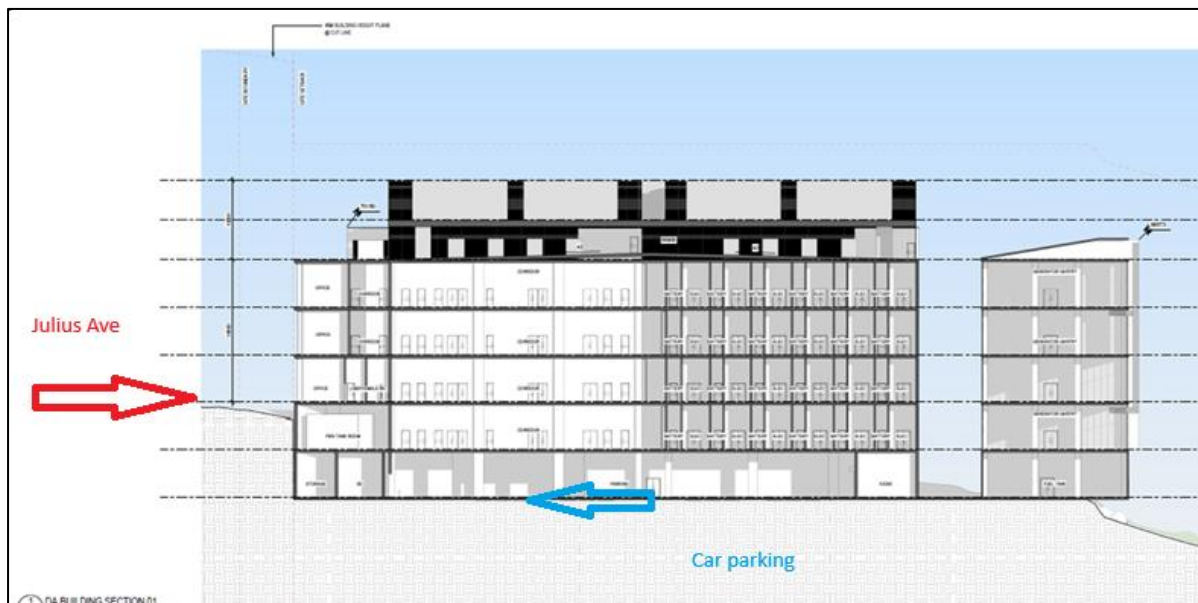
Ground Floor Car Parking Area (Source: Greenbox Architects, 2025)
